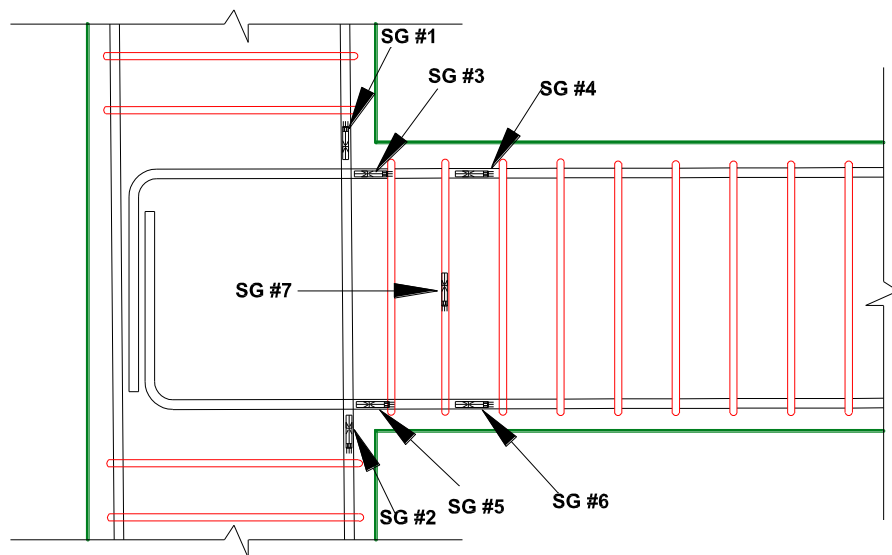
Layout of Steel strain gauges on Column and beam's reinforcement
